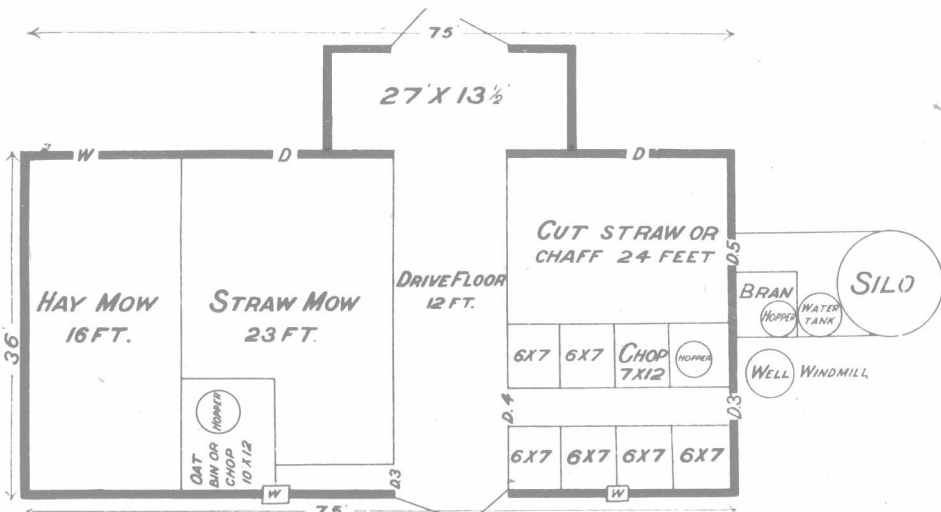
FIG. I.—UPPER-FLOOR PLAN OF BARN FOR 100-ACRE FARM.
